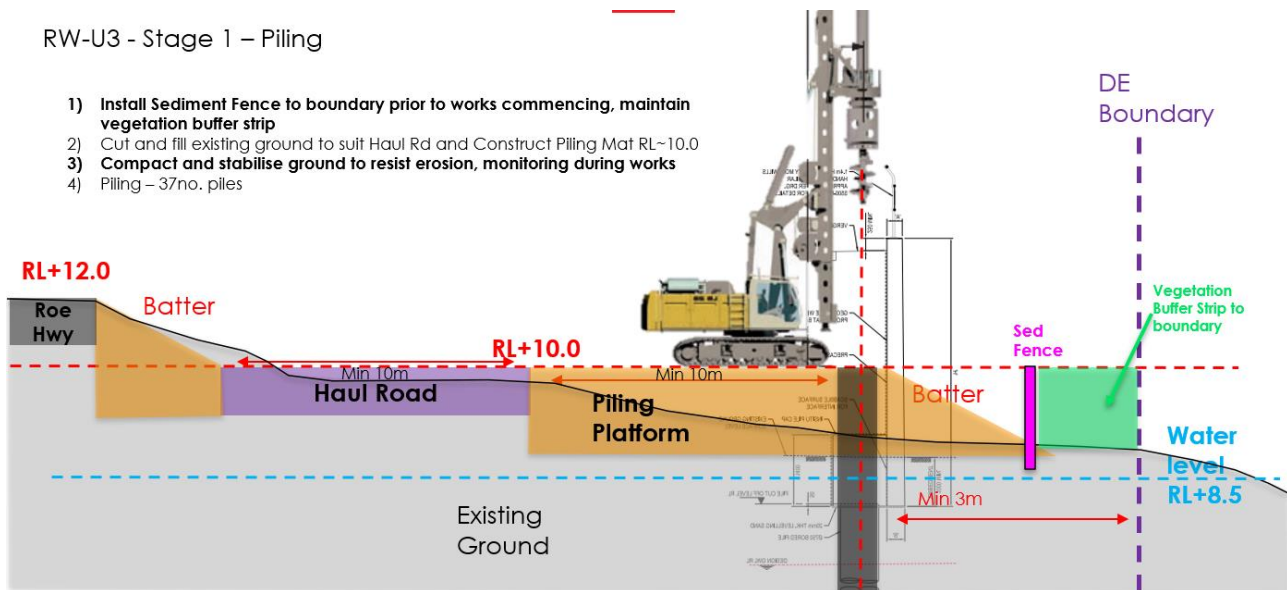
Retaining Wall (RW-U3) indicative Site Section during construction
